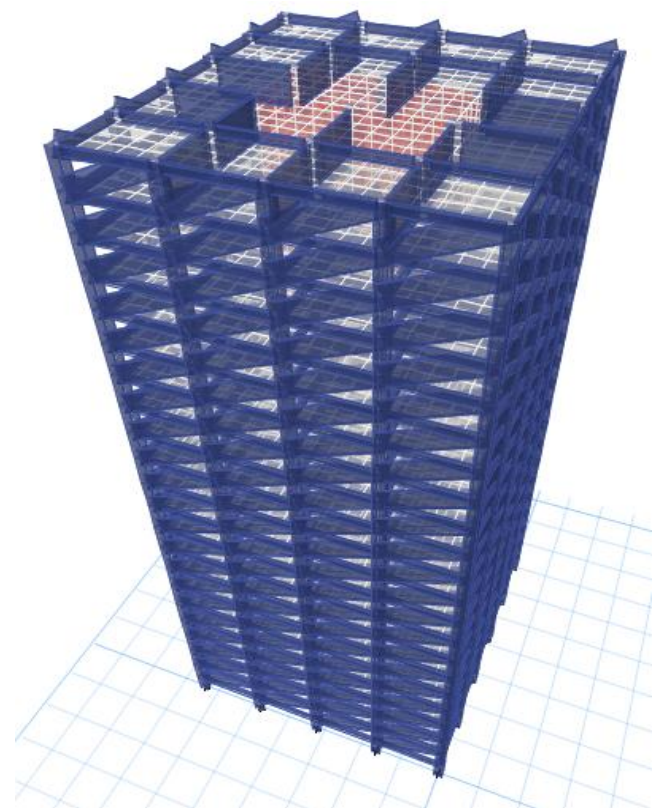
Building with core and in-filled masonry walls along with outrigger system (T1M4 & T1M5)
